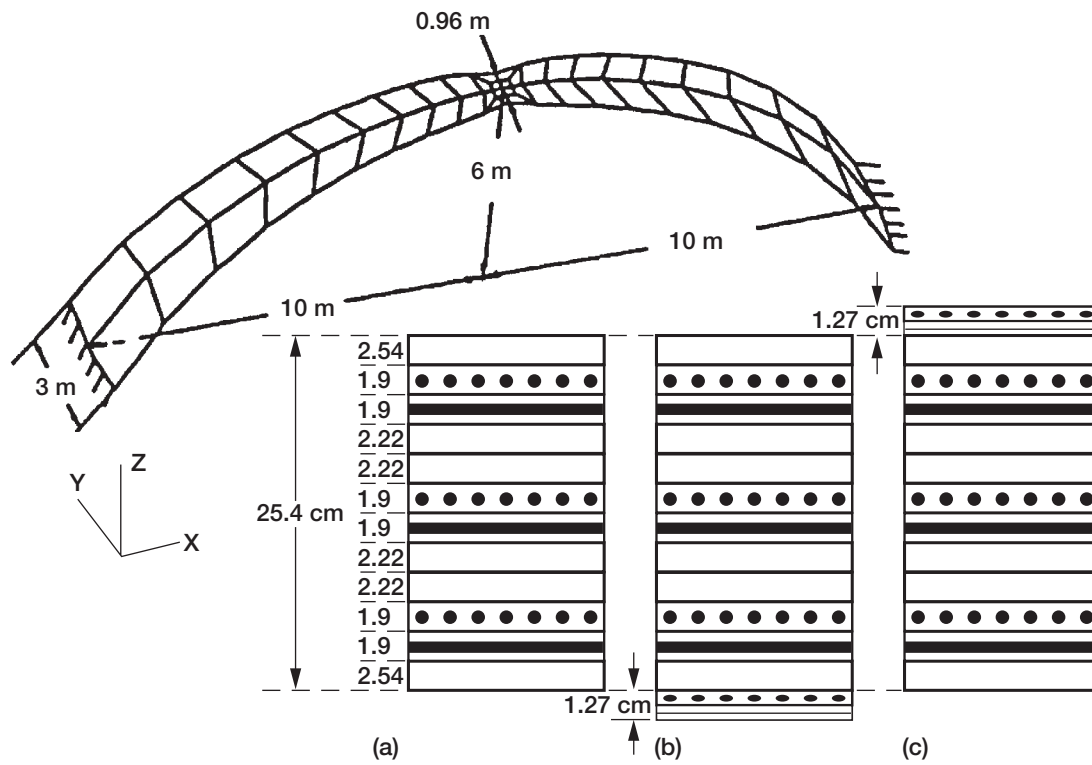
Reinforced concrete arch with composite enhancements. (a) Unenhanced. (b) Enhanced at bottom. (c) Enhanced at top.
